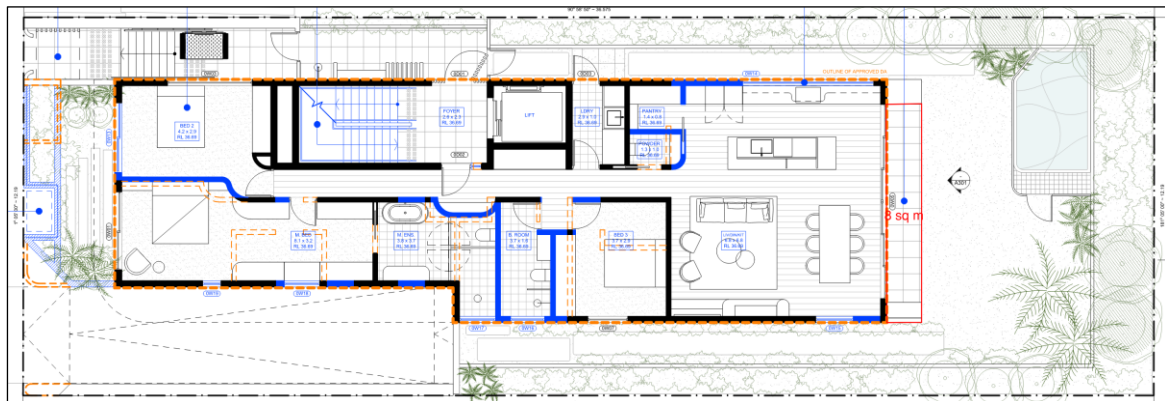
Proposed ground floor plan (source: Common Office, dated 5/11/2025)
